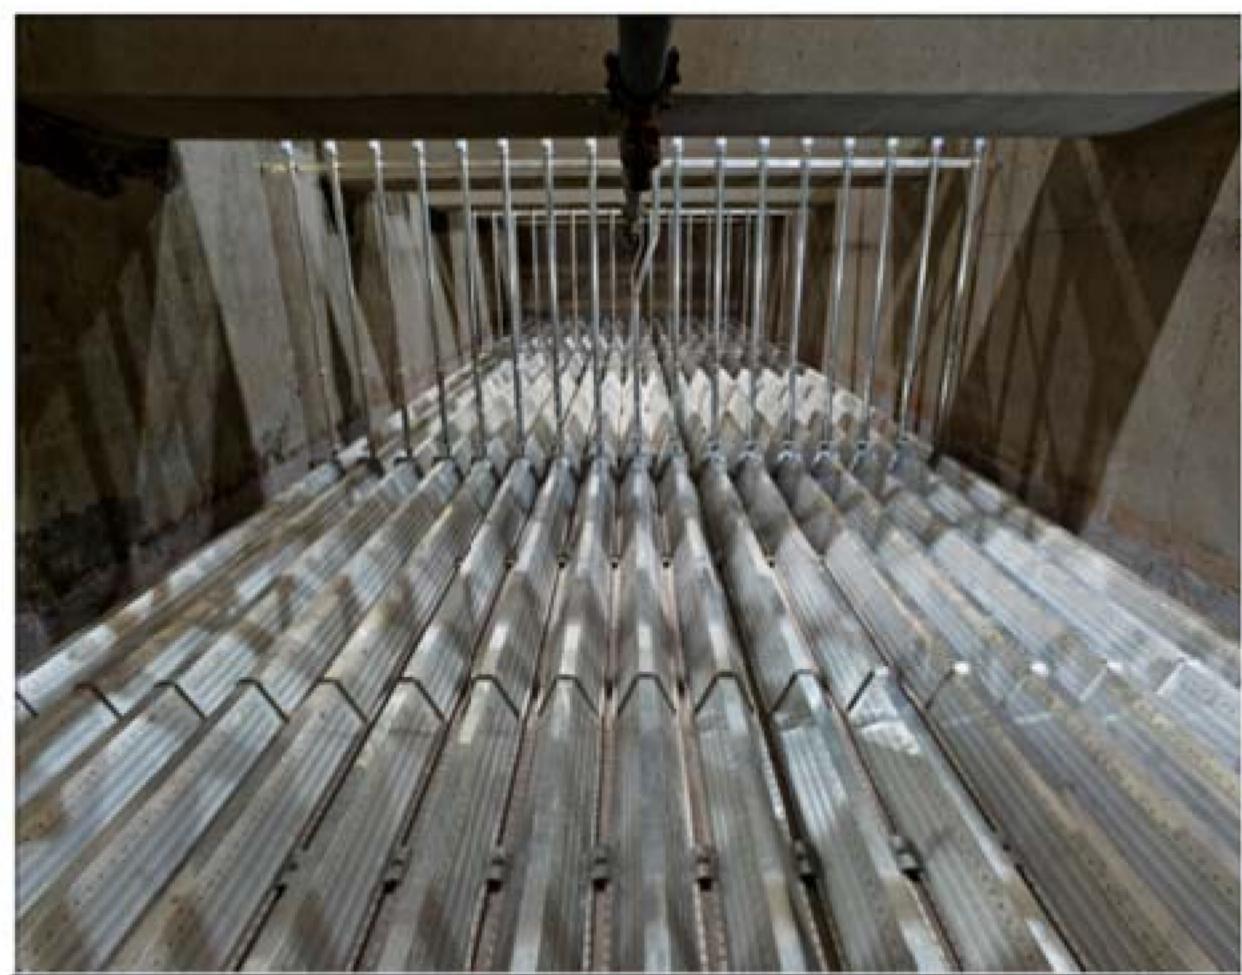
Completed installation of the new stainless steel underdrains and air scour piping in Filter #4.
